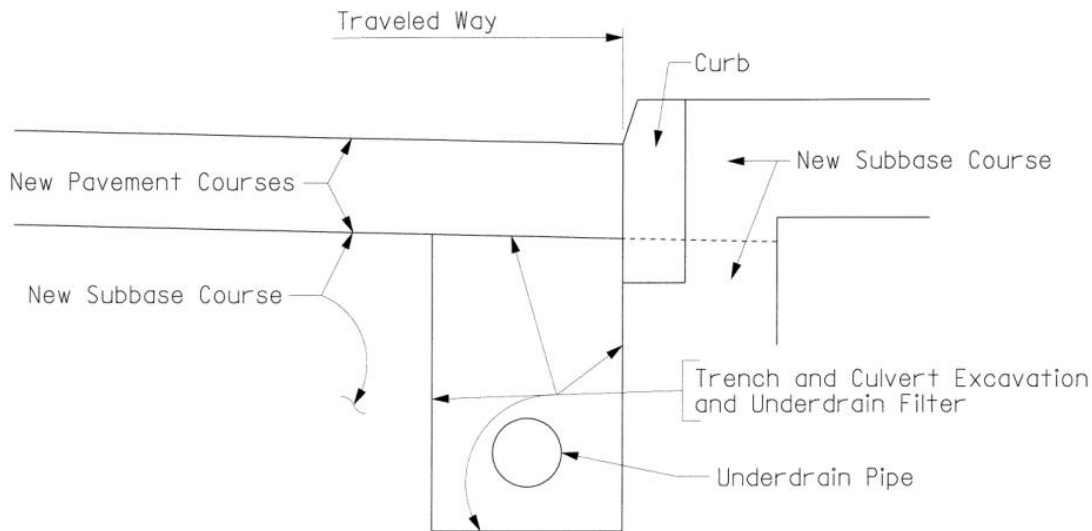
Edge-of-Pavement Drain: Curbed Section
